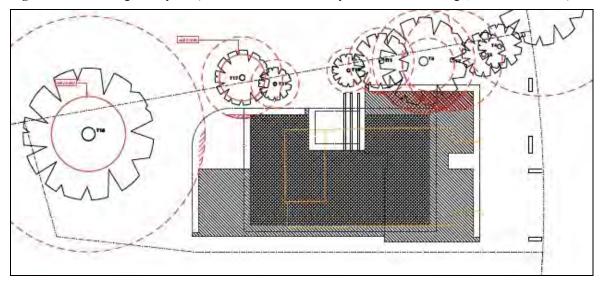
The existing site layout. (Source Demolition Plan by JR Residential Design, dated 19/10/2020)
